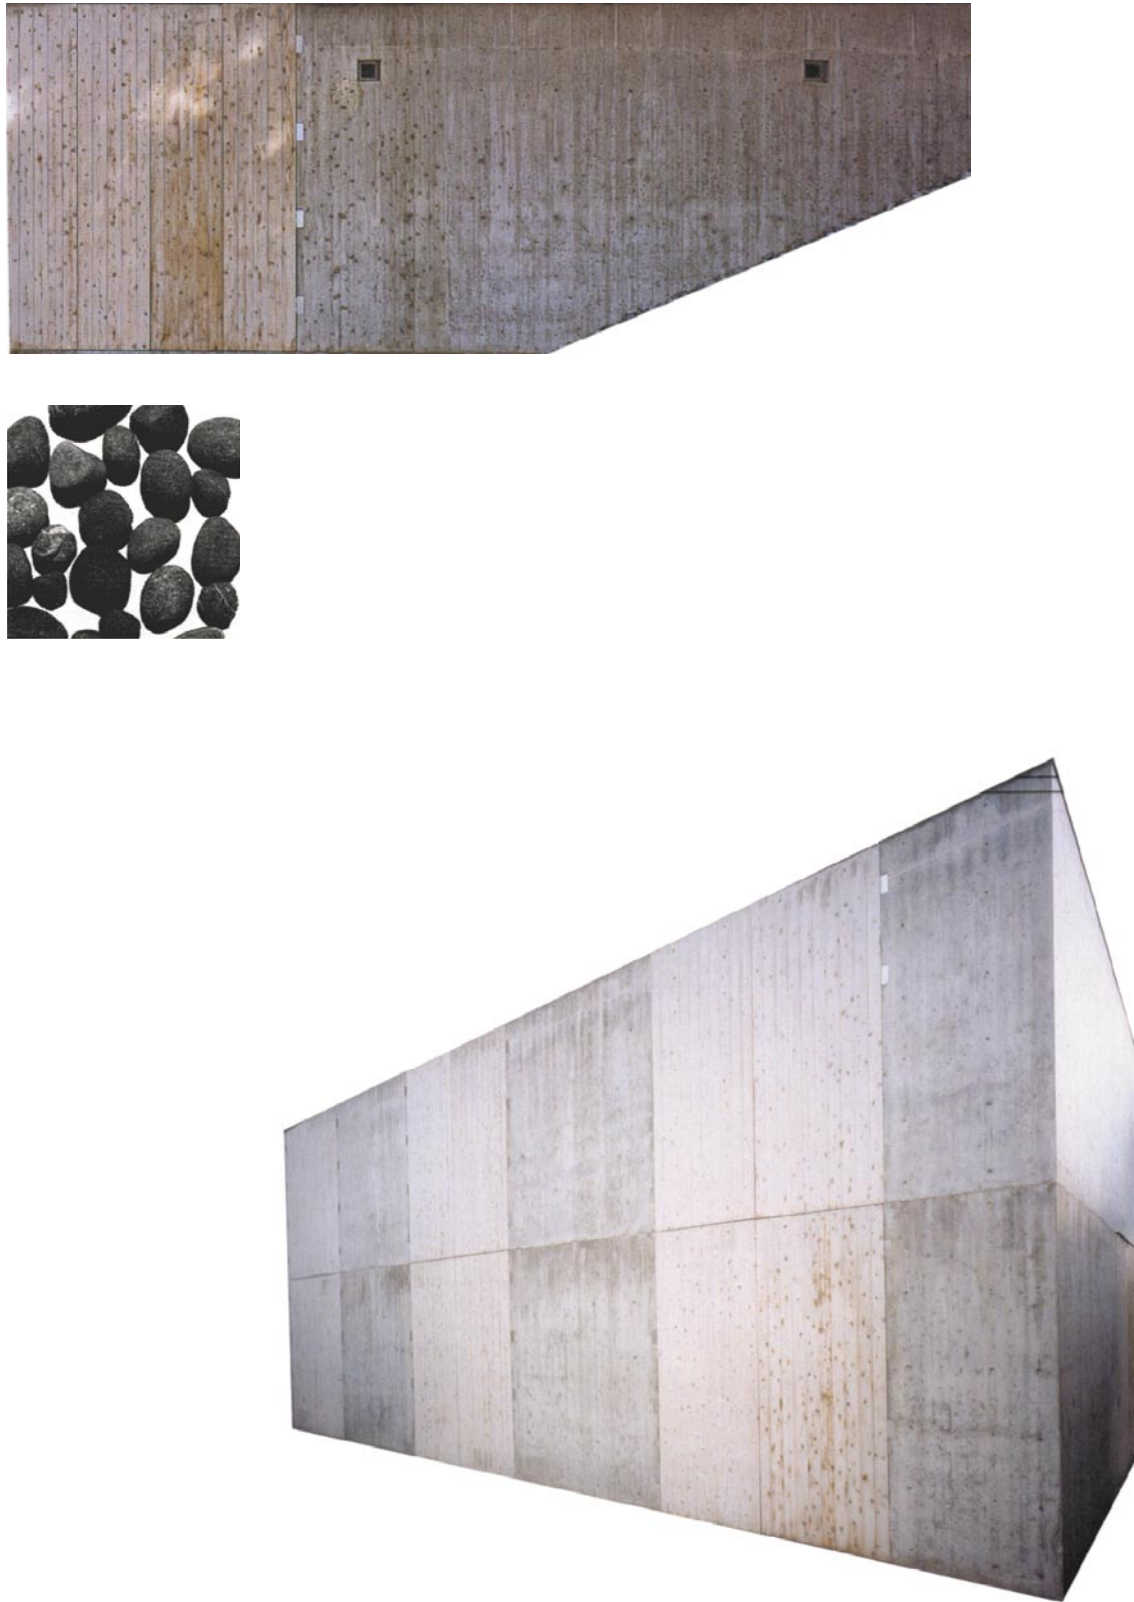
Cedar wood off shutter concrete and recycled cedar shuttering planks wall. Sambuichi Architects, Miwa Gama ceramic studios, 2001 -2002. Hagi, Japan.
